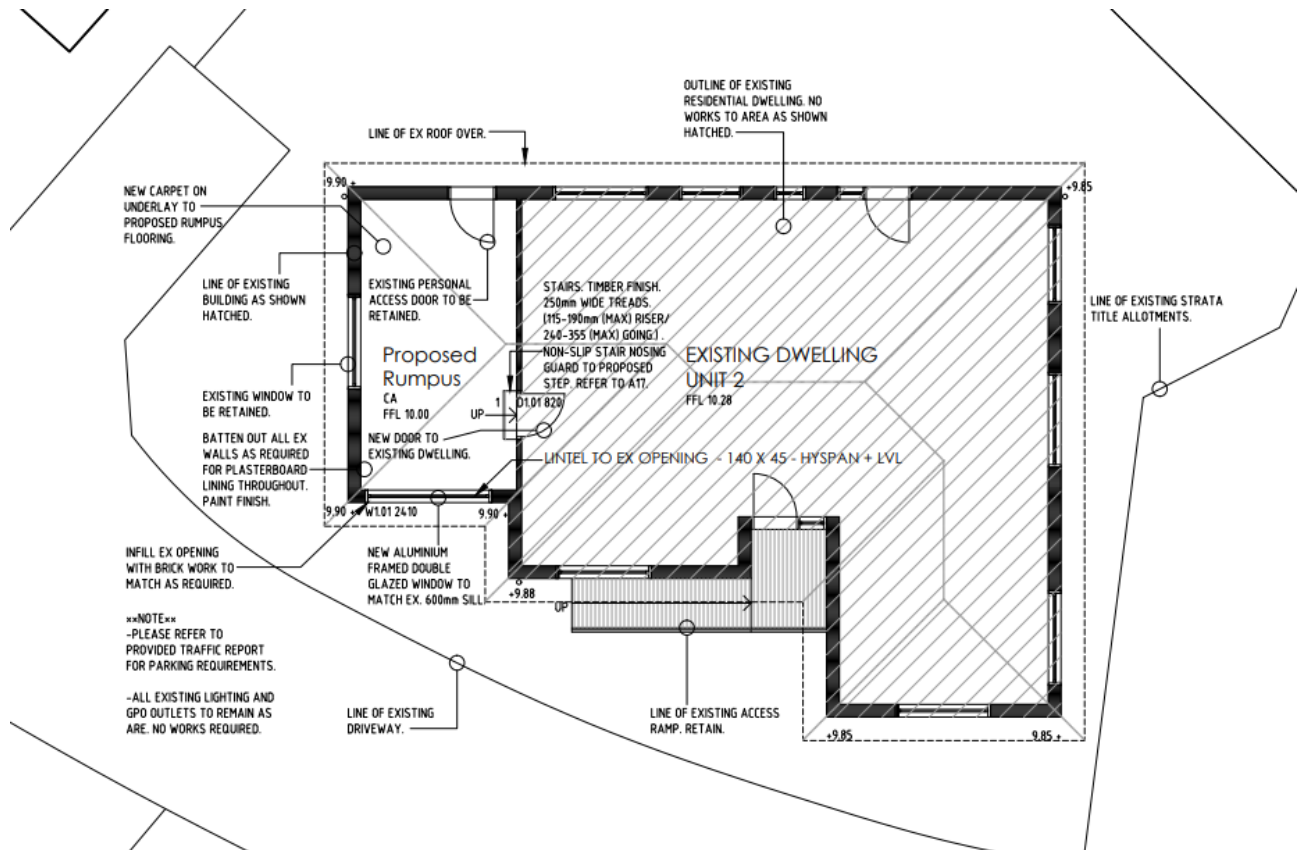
Proposed floor plan of 2/10 Kensington Street detailing the FFL of the proposed and existing rooms. submitted with the development application (07/12/18).
